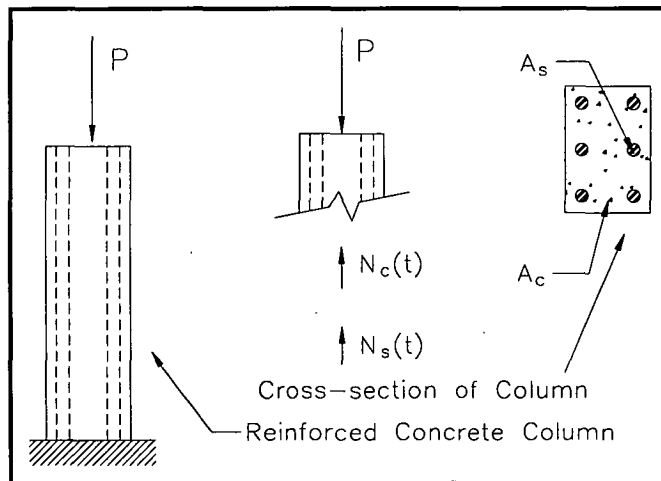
Short symmetrically reinforced concrete column with applied load P .
